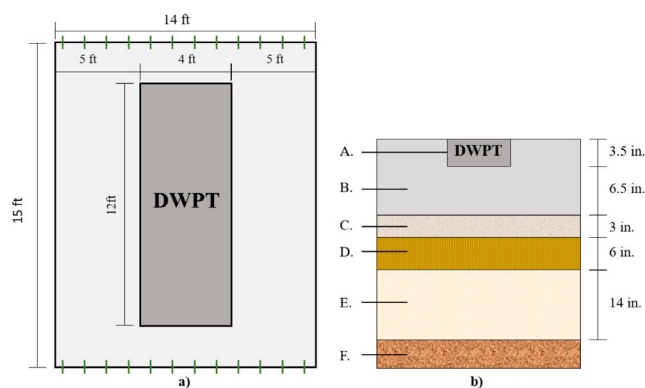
(a) Plan View of the DWPT Testbed Pavement Section and (b) Cross-Section of the Pavement Structure.
